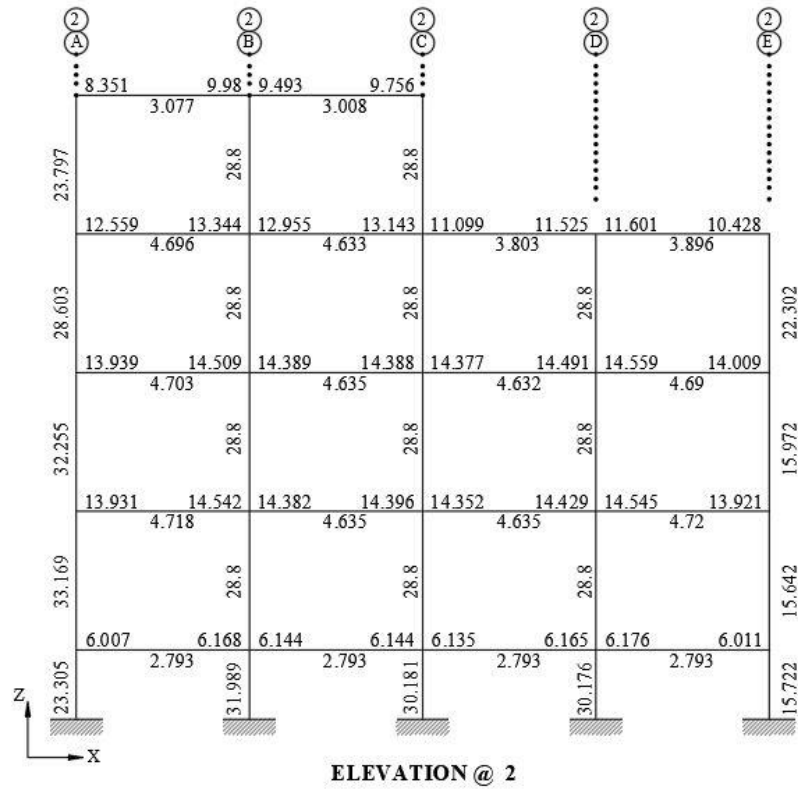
Reinforcement details for 4 storey building for grid -2
